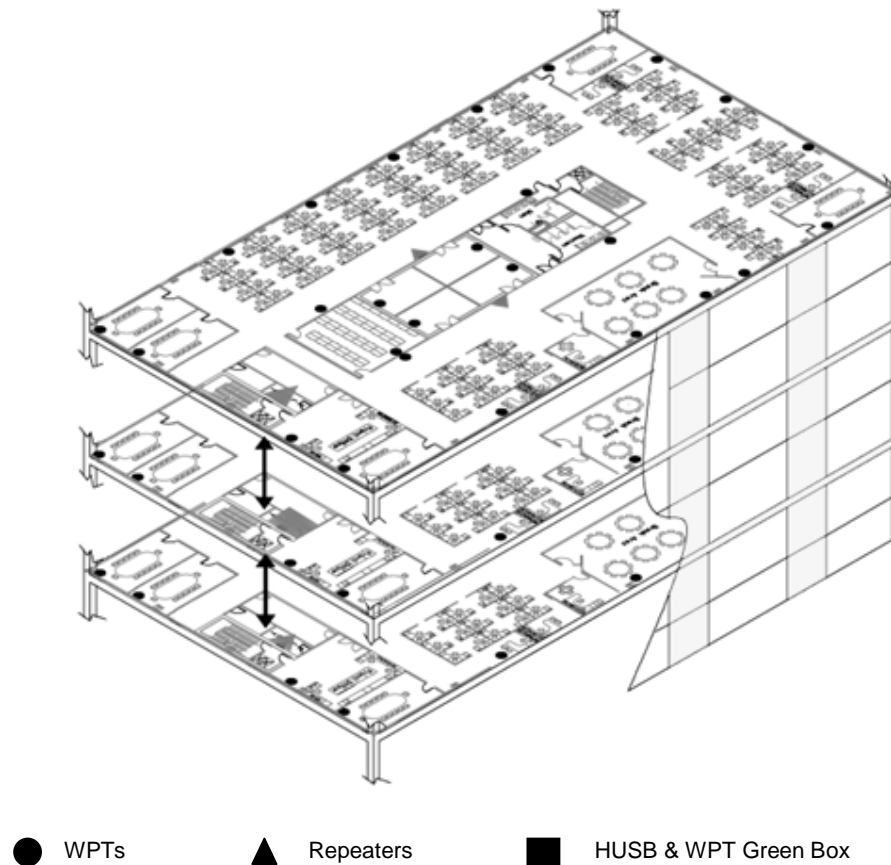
WPT Wireless Network in a Multi-floor Office Building
